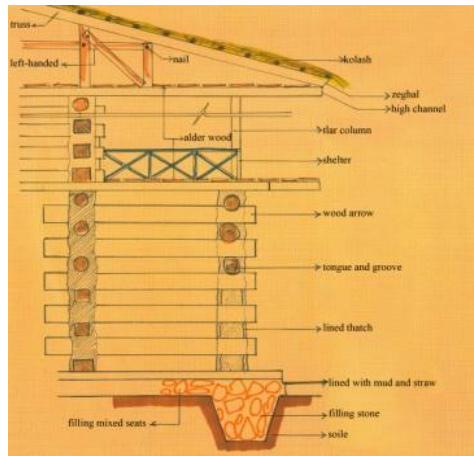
Vertical cross-section of the wall, Gilan Cultural Heritage.
